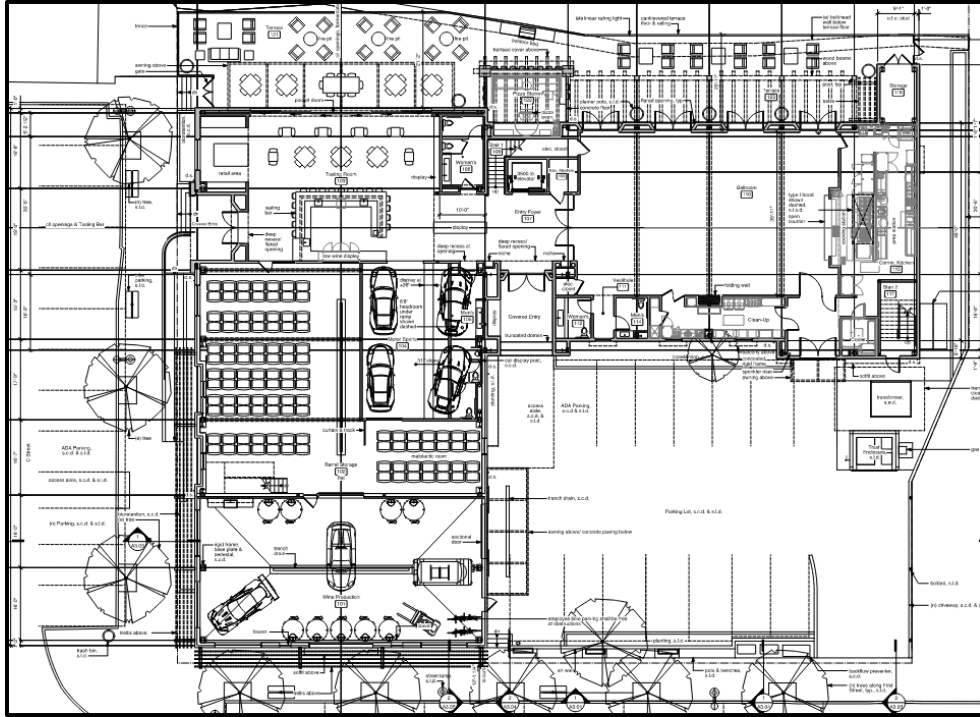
Site Plan – Approved (Attachment F, Sheet A2.02)
